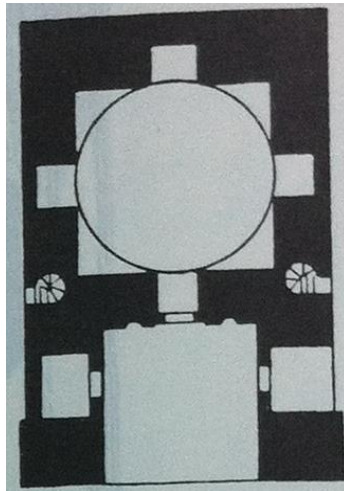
Serahs Tomb ground floor plan (Pope, 1969)
